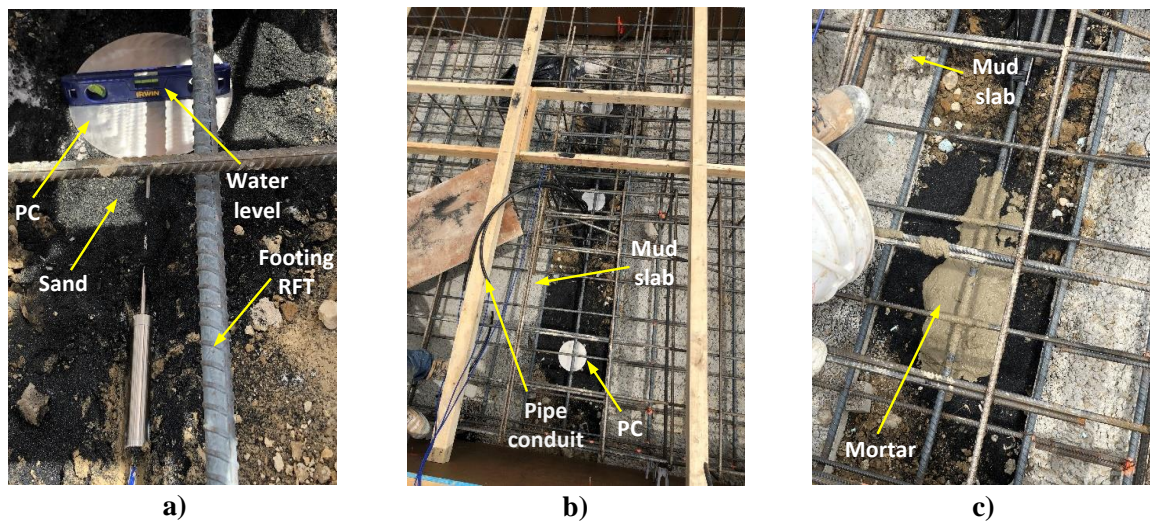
Footing pressure cells installation for the Pickering culvert: a) pressure cell leveling; b) cables routing; and c) mortar pouring.
